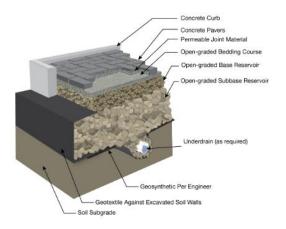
Permeable concrete paver detail Photo: Portland Cement Association
